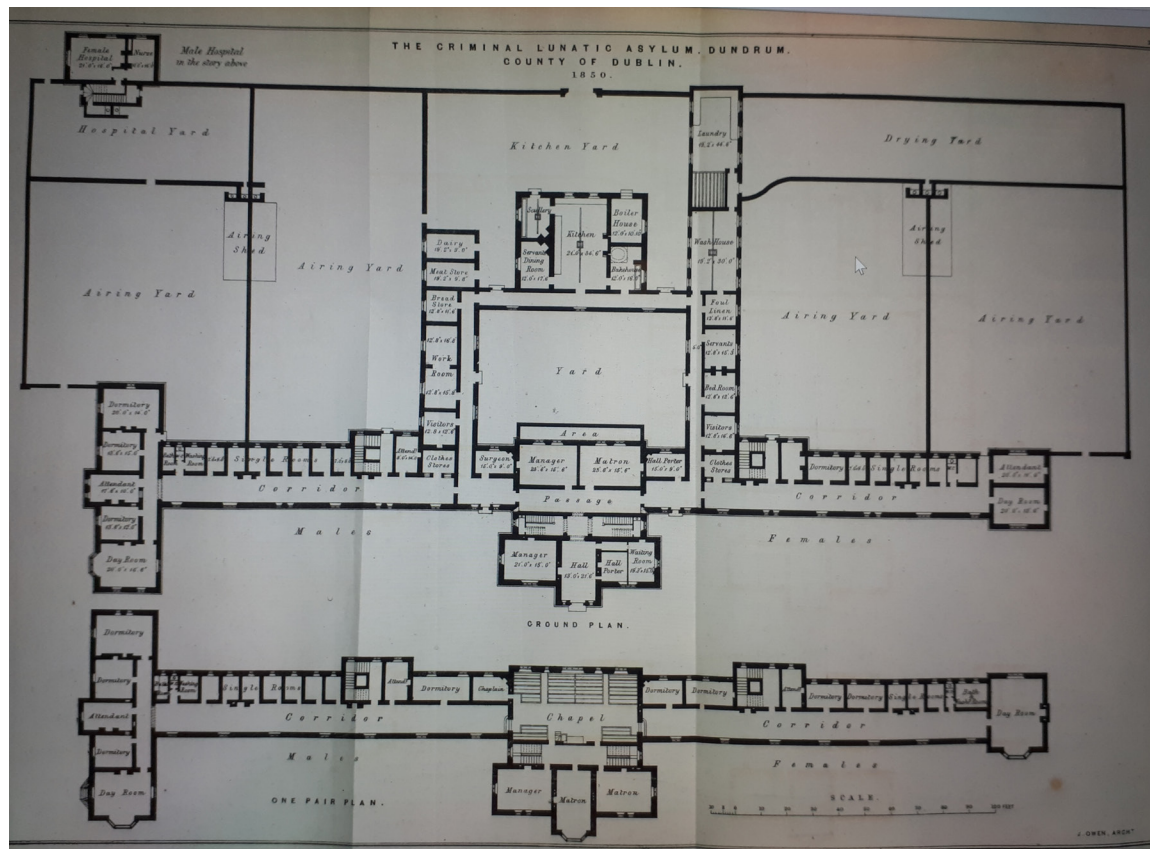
| 1850, Engraving of Floor Plan and Annotated Layout, Jacob Owen Architect (Wellcome Collection V0012562).
